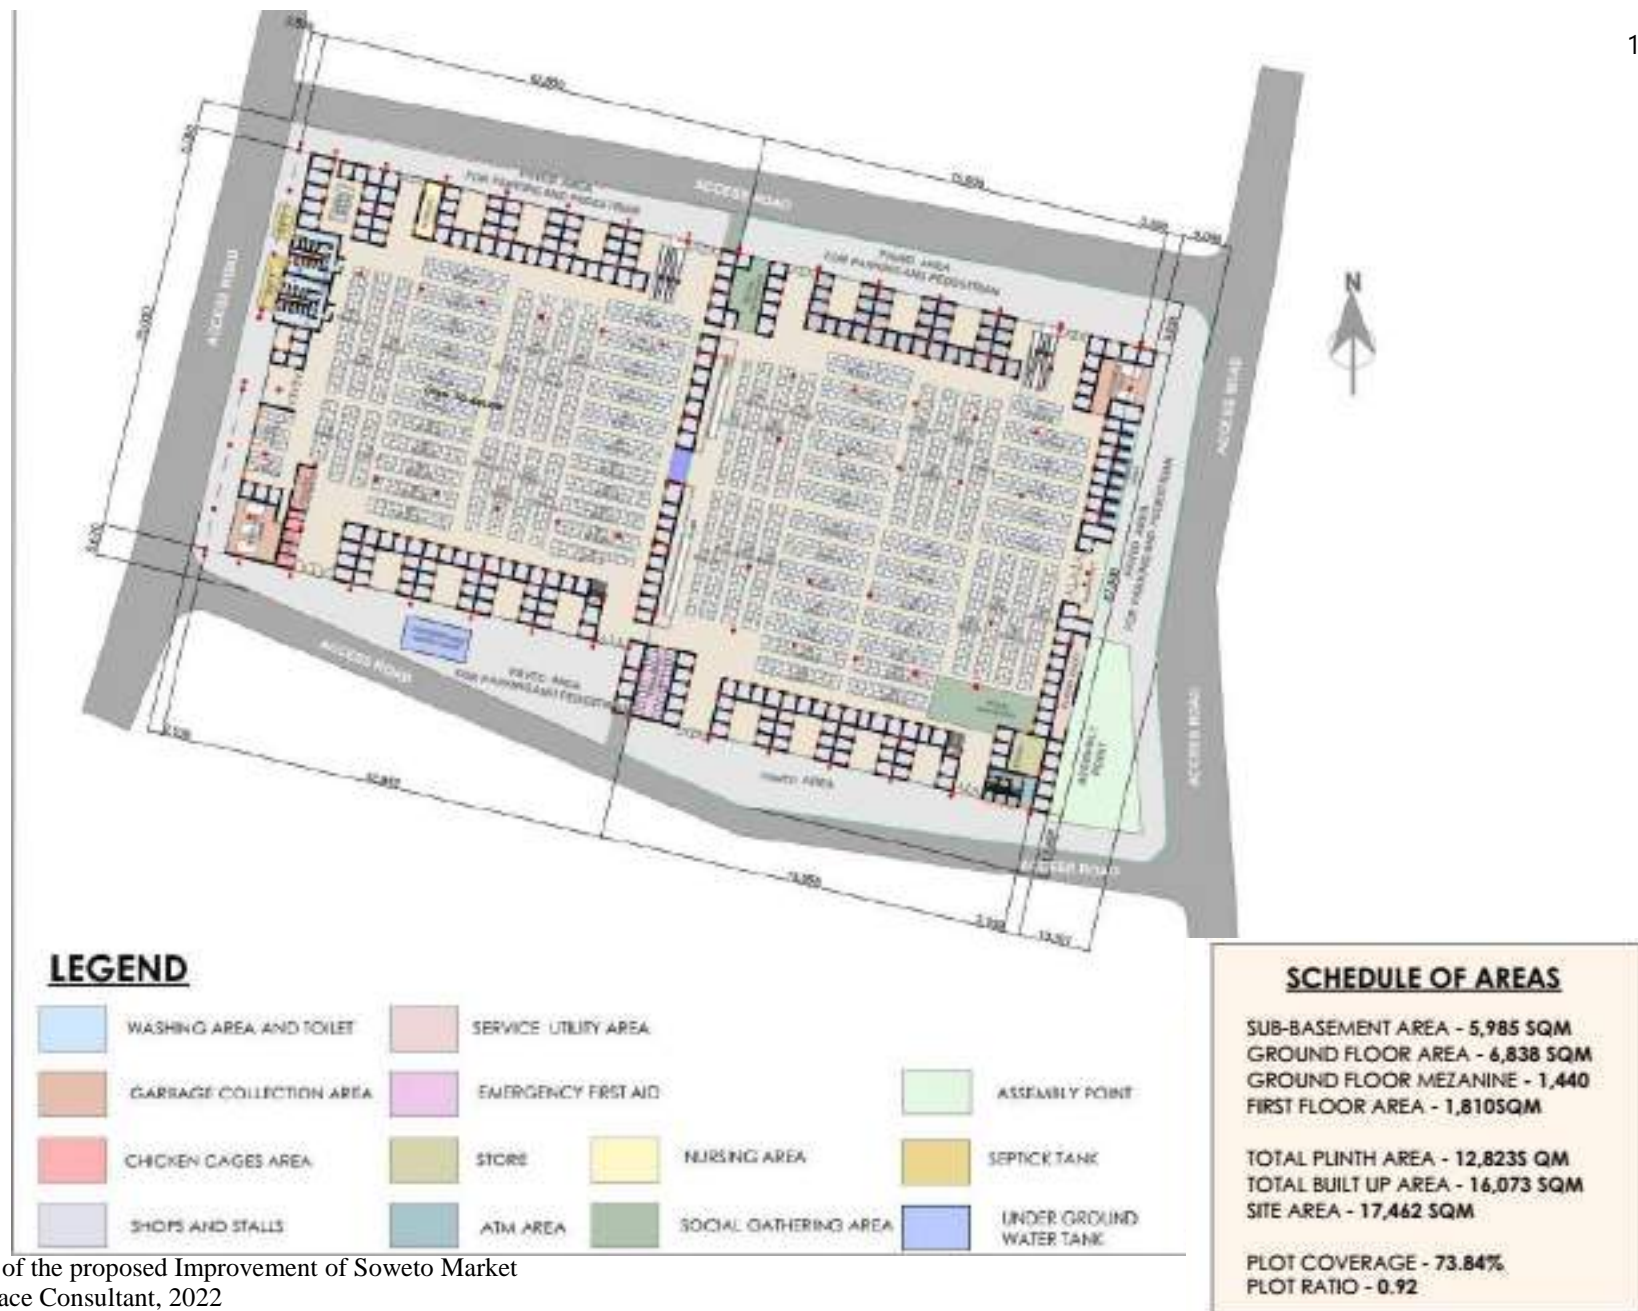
Layout of the proposed Improvement of Soweto Market
